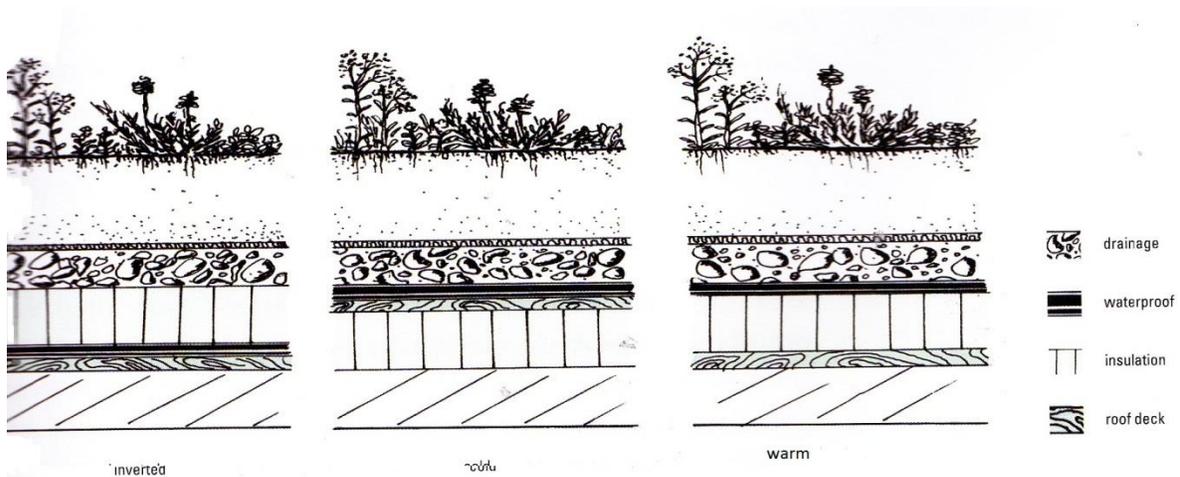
Roof construction types according to the insulation layer location. (Dennett, &Kingsbury, 2008).
